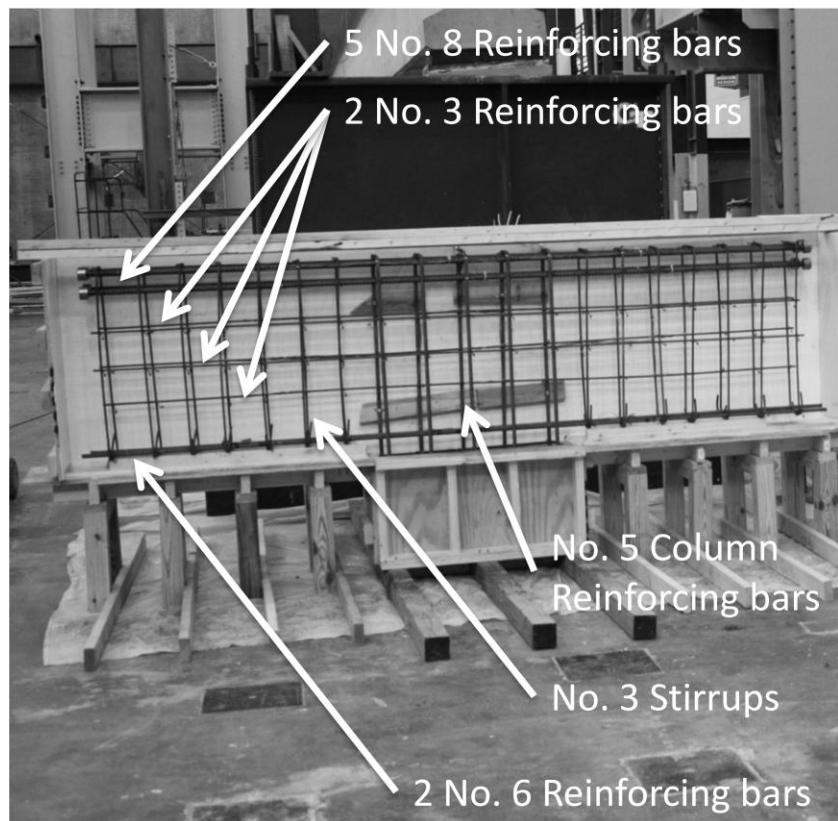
Specimen reinforcement meeting AASHTO LRFD Bridge Design Specification (2007)
